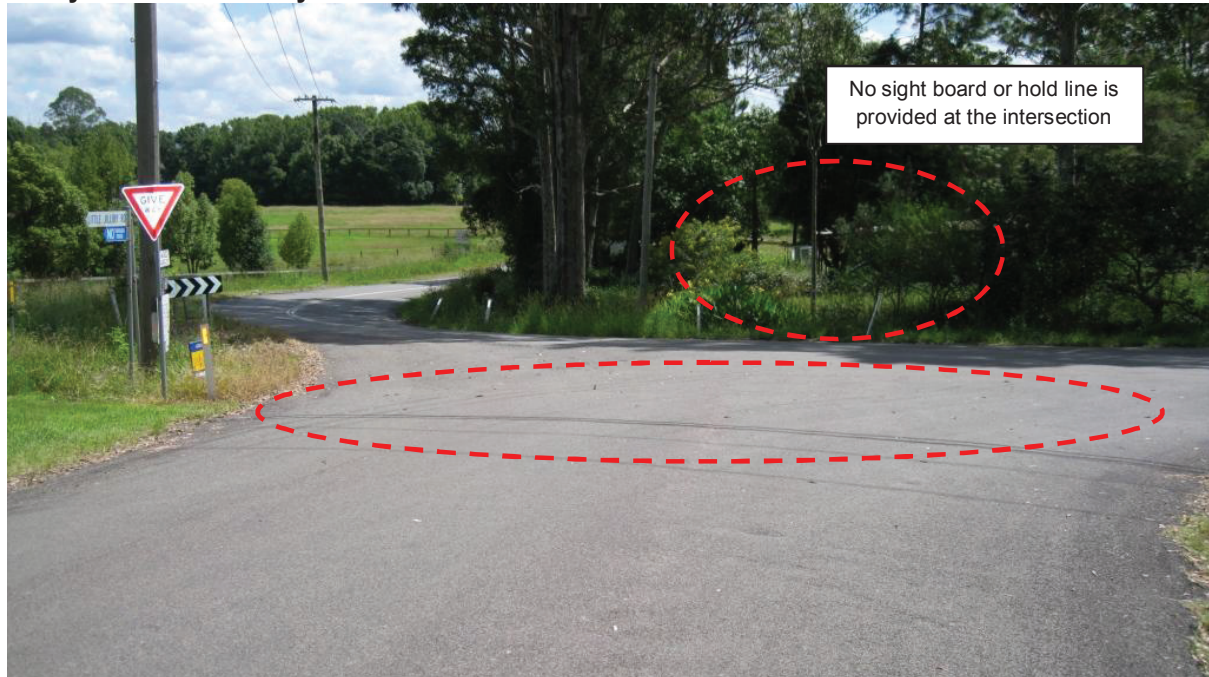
Little Jilliby Road, looking east toward its intersection with Jilliby Road
